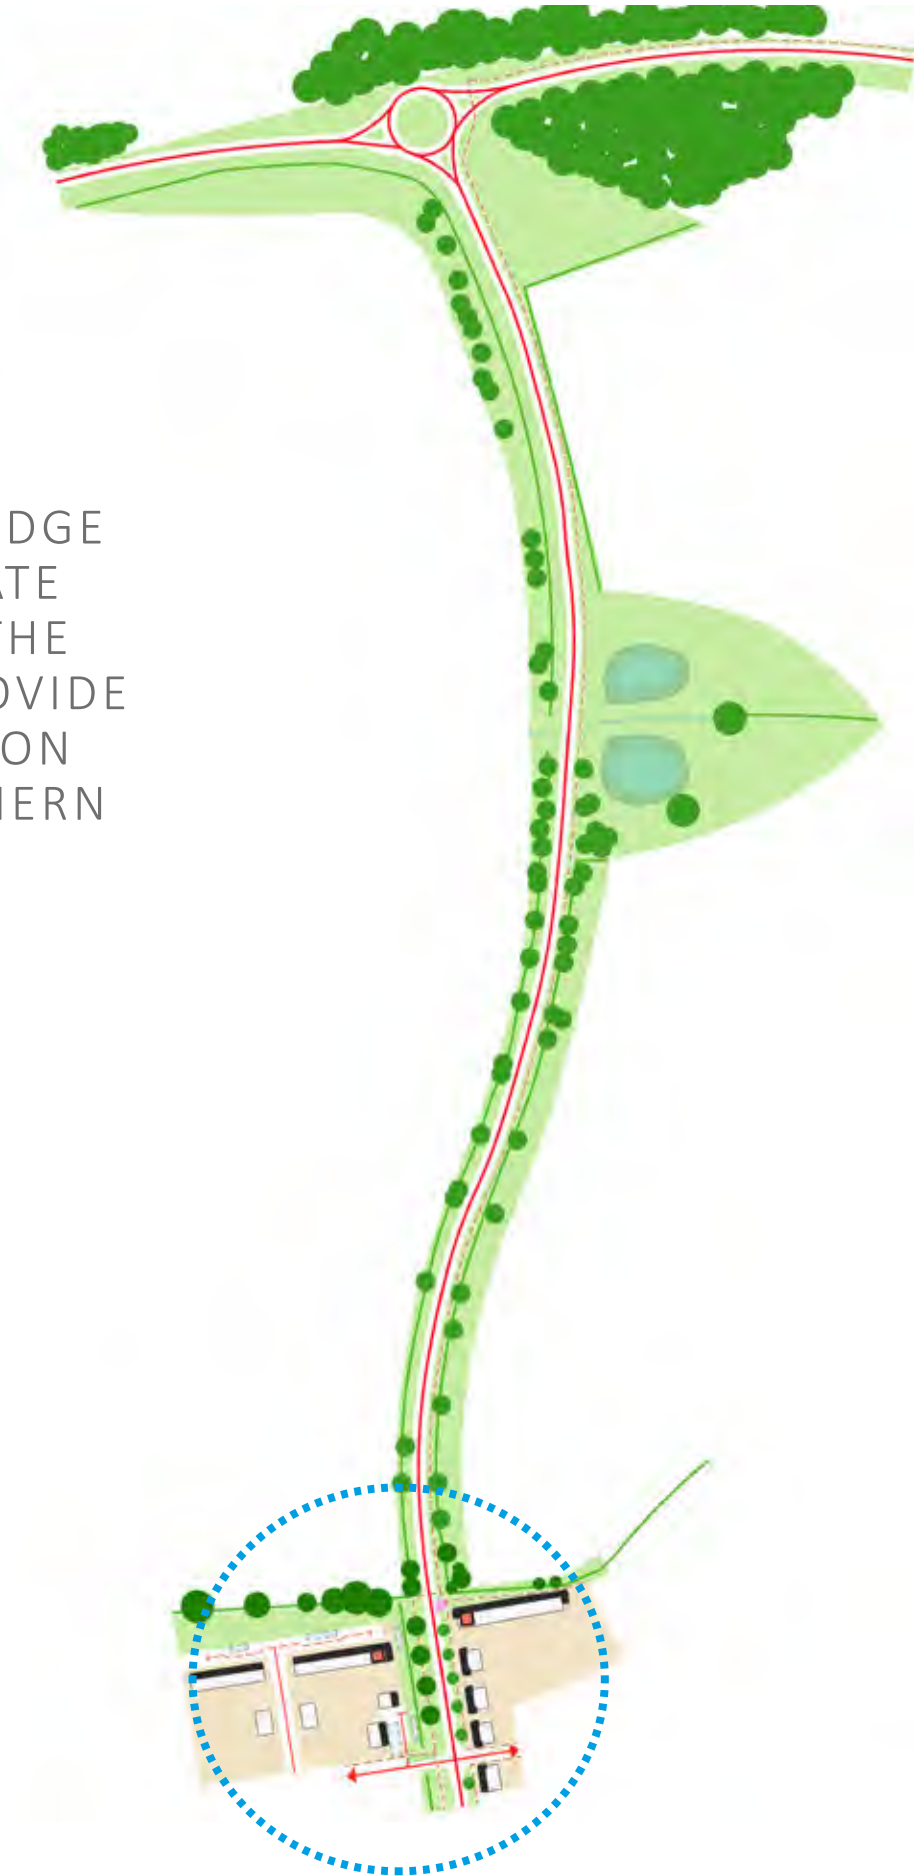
GATEWAY DESIGN PRINCIPLES PLAN
